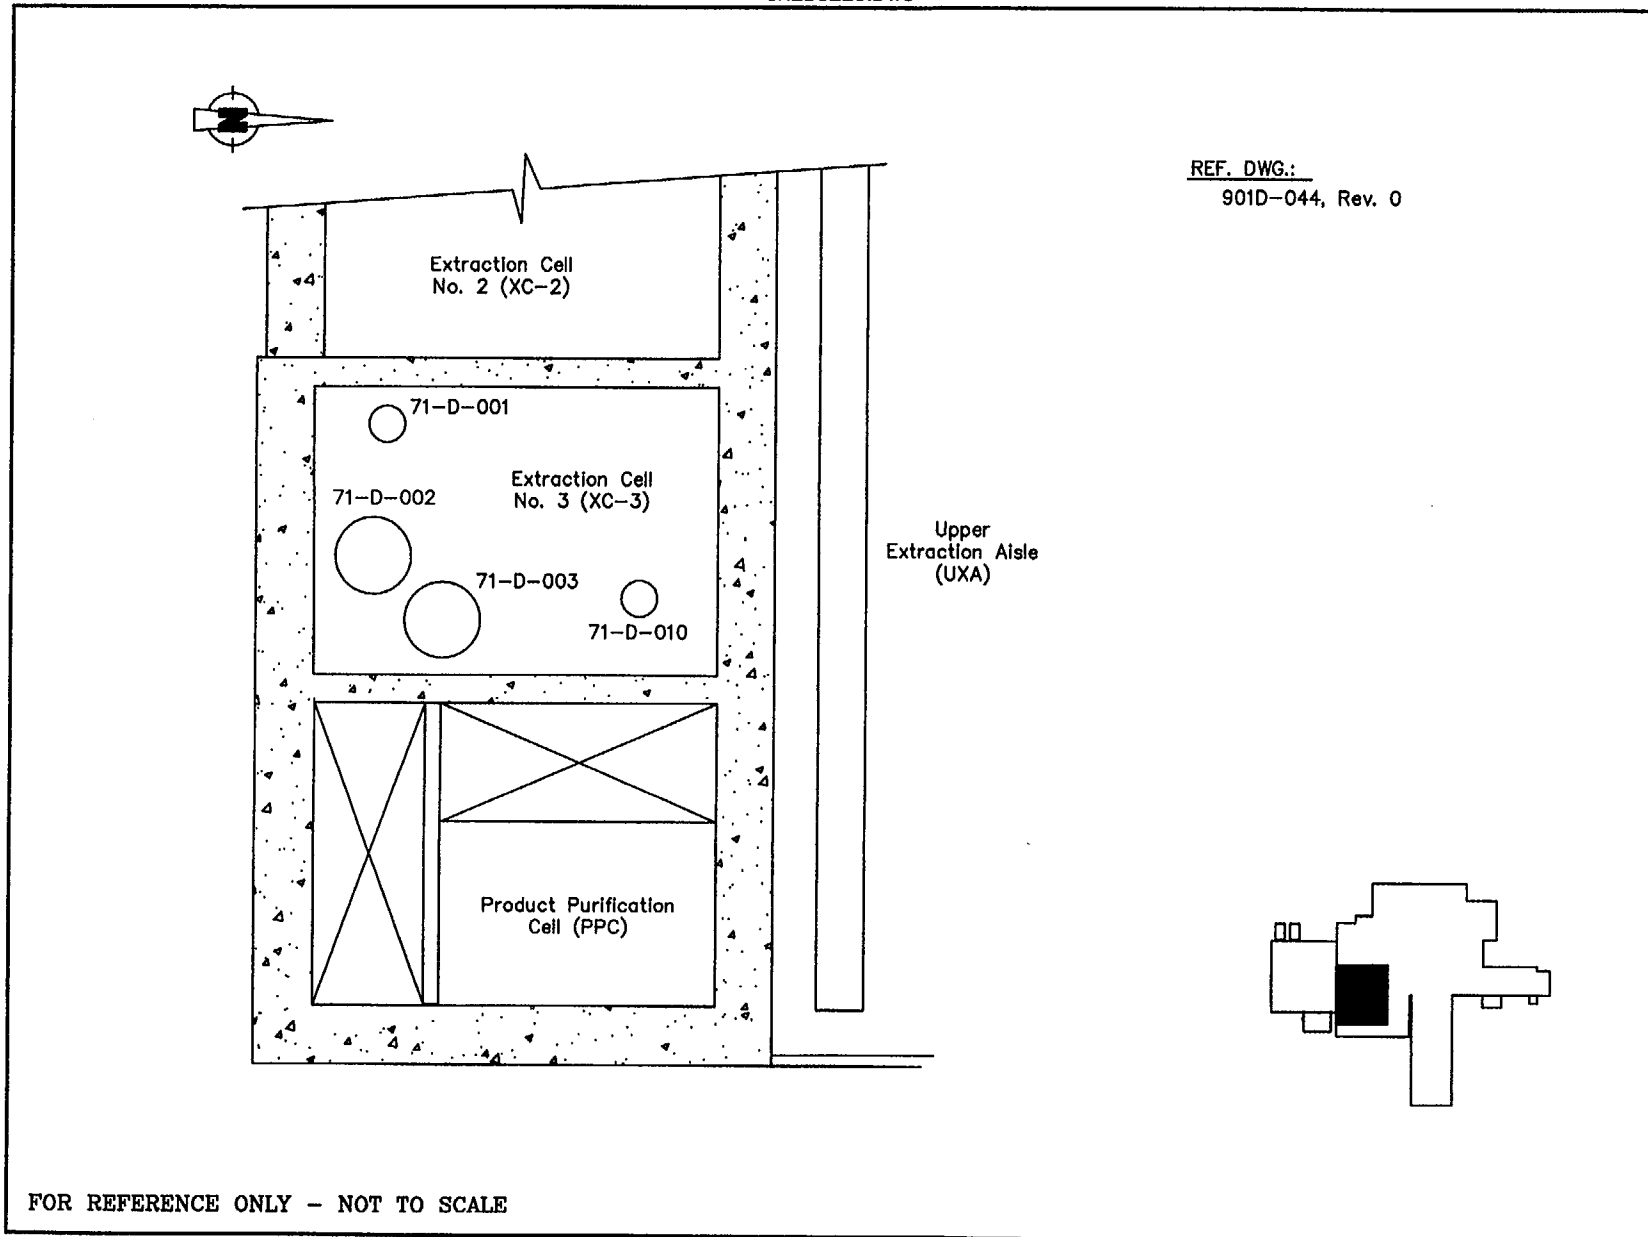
LWTS Plan at Elevation 144.0'
